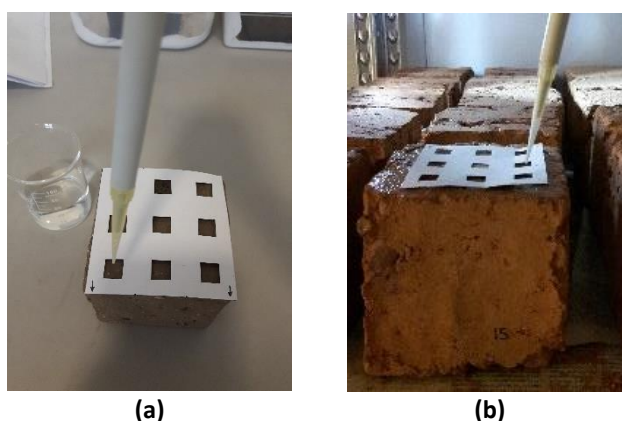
Example of contact sponge test procedure: (a) adobe specimen; (b) rammed earth specimen.
